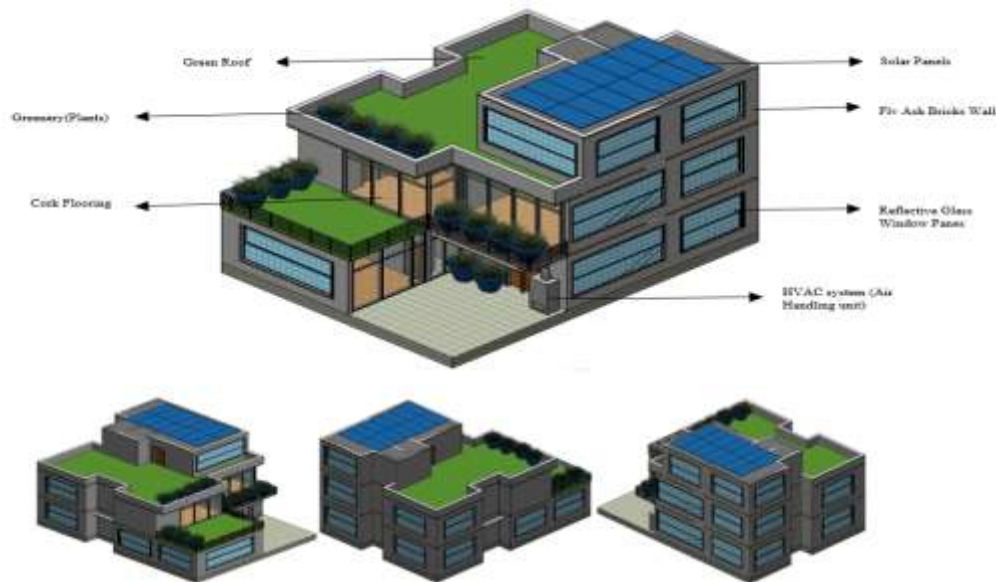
3D elevations of green building model generated on Autodesk Revit.
